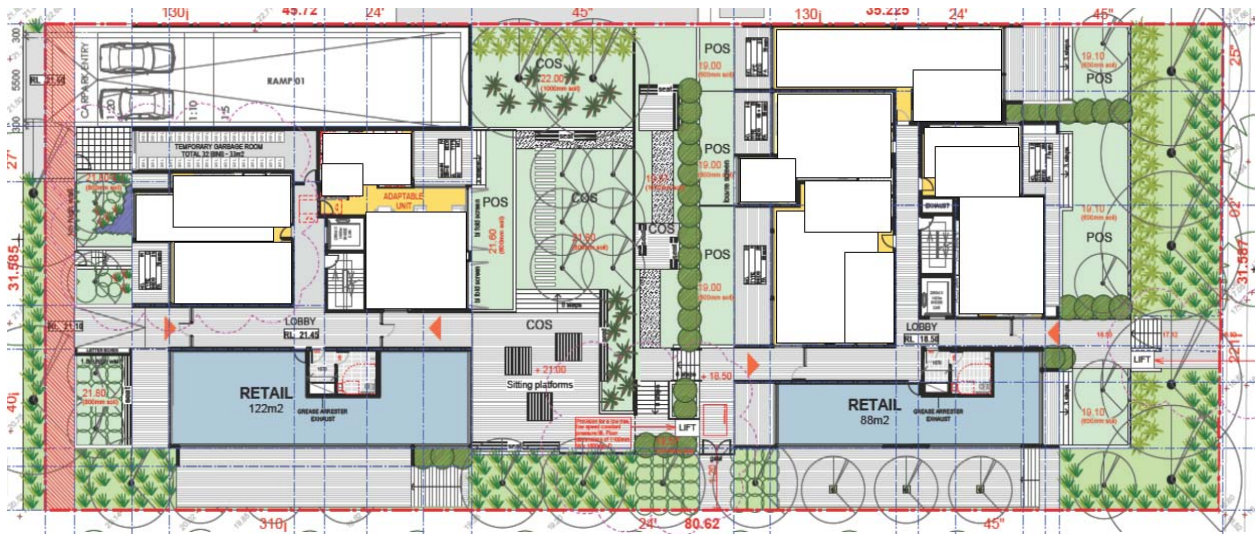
Location of the retail premises – on the ground floor of each of the buildings, with the retail facing each of the respective streets and facing Hayes Reserve.
